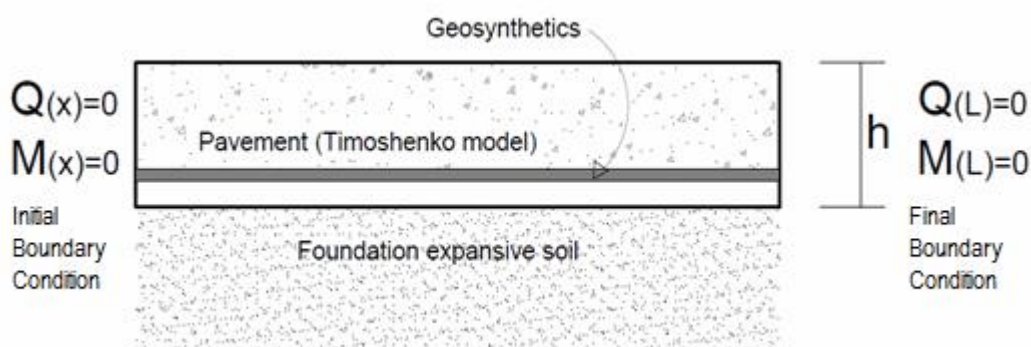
A schematic diagram of a typical geosynthetic-reinforced pavement on expansive soil.
